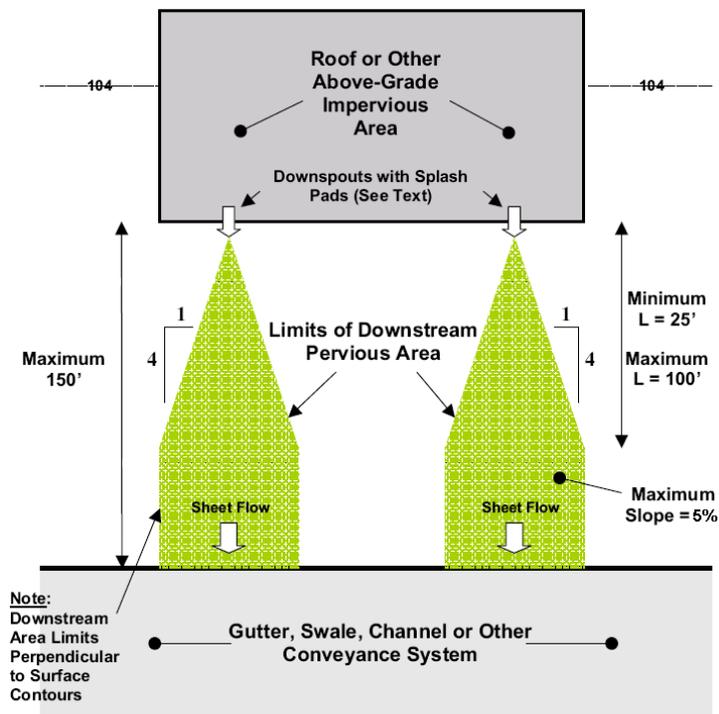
Standards for disconnecting impervious surface via downspouts. Source: New Jersey Department of Environmental Protection, 2005.
